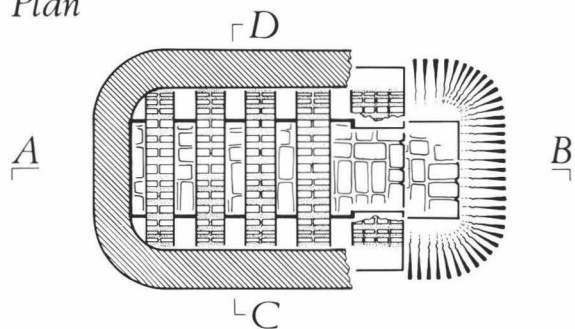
Reconstruction drawings of the Upper Norwood kiln.
